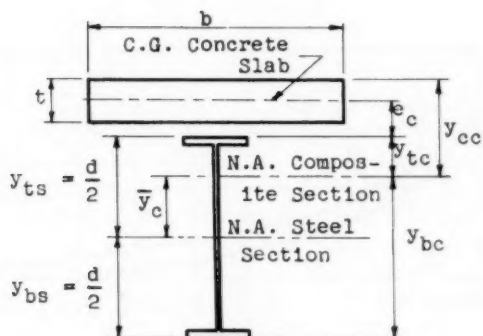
COMPOSITE BEAM WITH SYMMETRICAL STEEL SECTION
